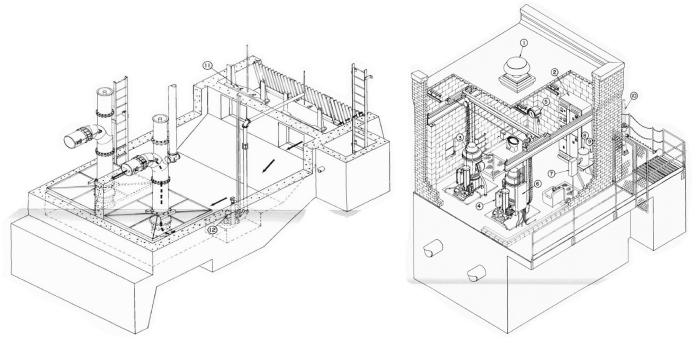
Pump Station Layout (Franey Lake Pump Station)
